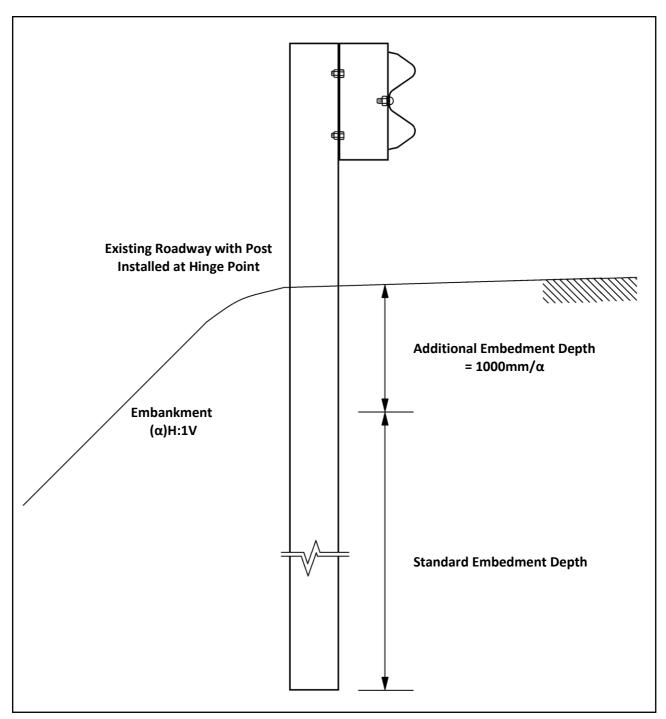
Recommended Adjacent Grading for W-Beam Guardrail
